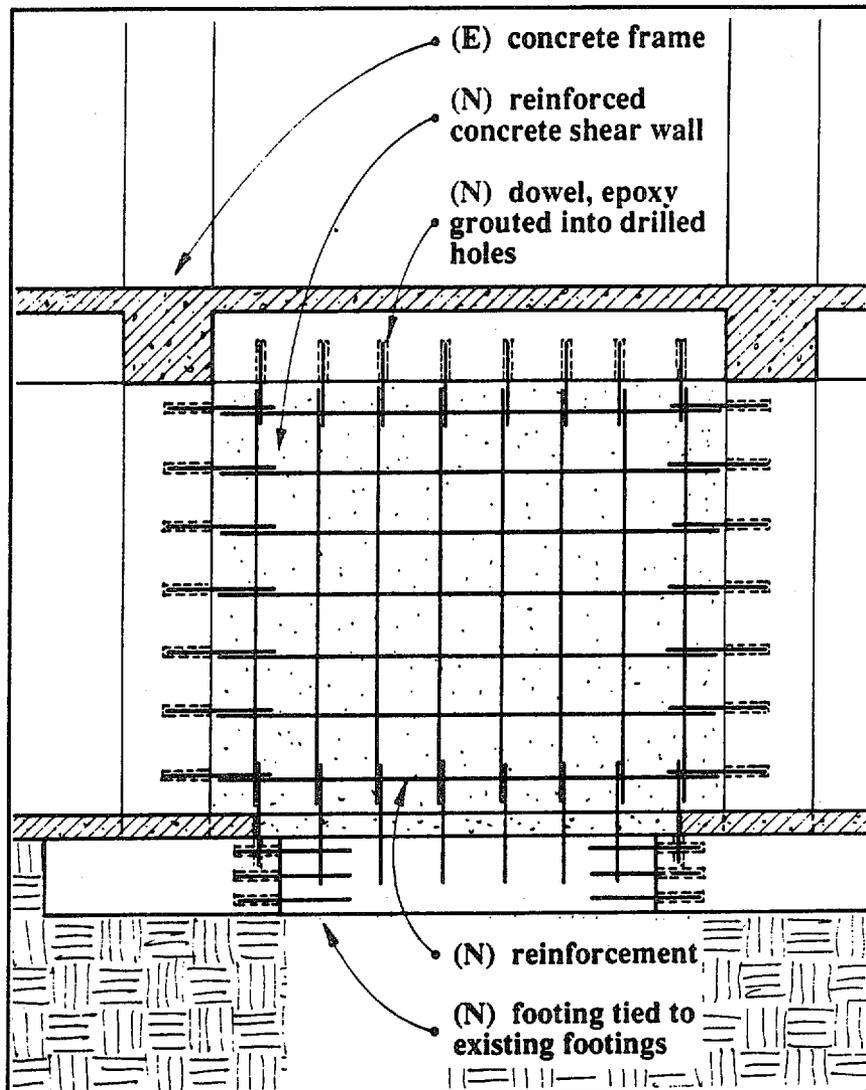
Strengthening an existing concrete frame building with a reinforced concrete shear wall.
